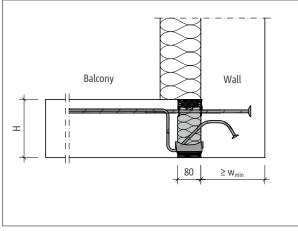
Schöck Isokorb® T type K-U: Wall connection upwards with external insulation
